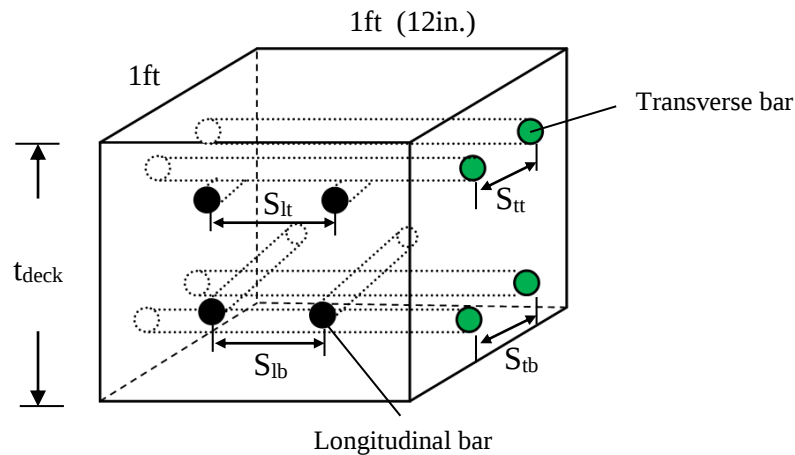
Schematic diagram of the reinforcement details per unit deck
